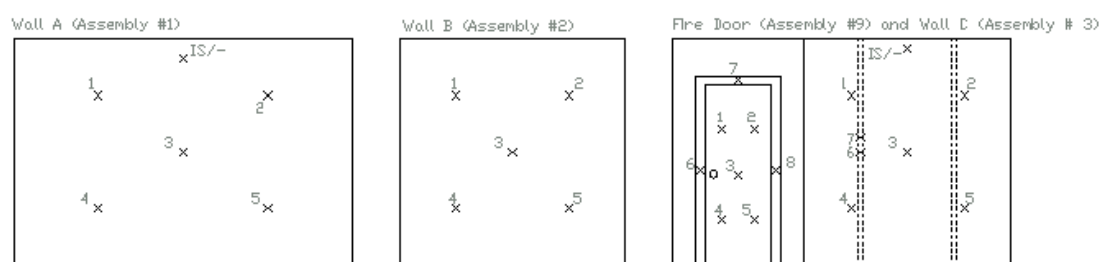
Thermocouple positions (elevation view) on wall and door assemblies – Test#1
